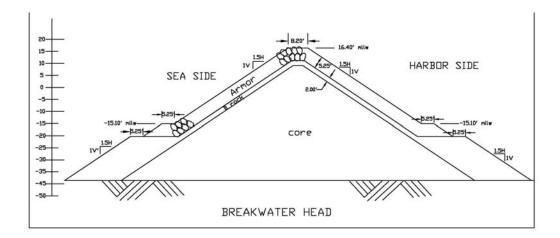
The Breakwater Head Cross Section is common to Alternatives 1 and 15.
